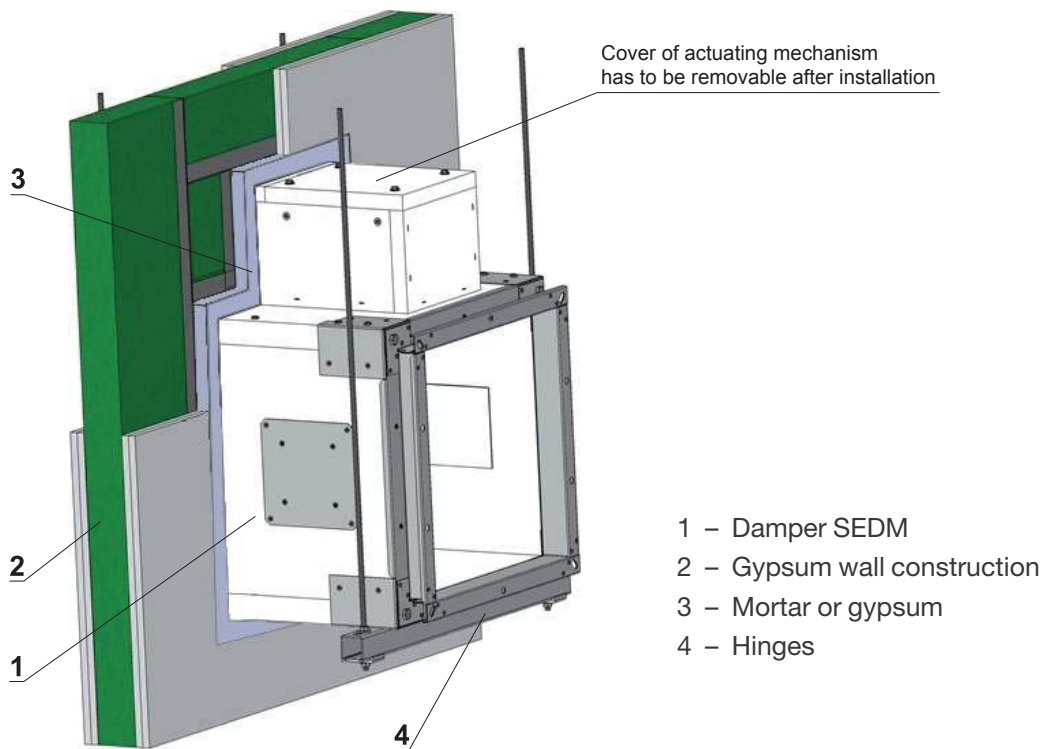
Example of installation in gypsum wall construction of fire compartment - vertical blade axis position
